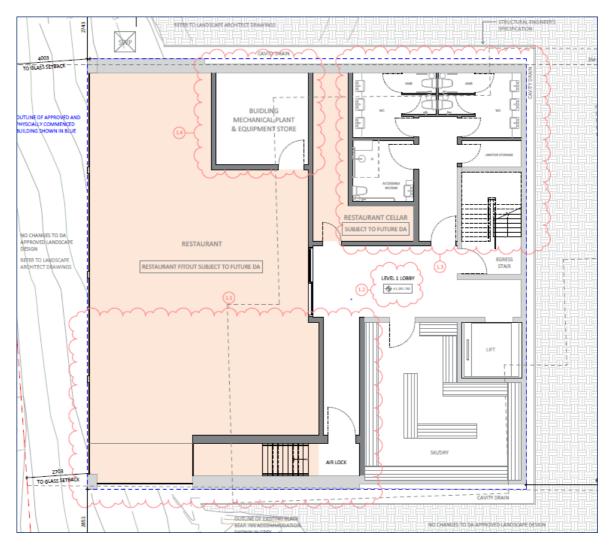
| Amended Level 1 plan (Source: Applicant's documentation)
